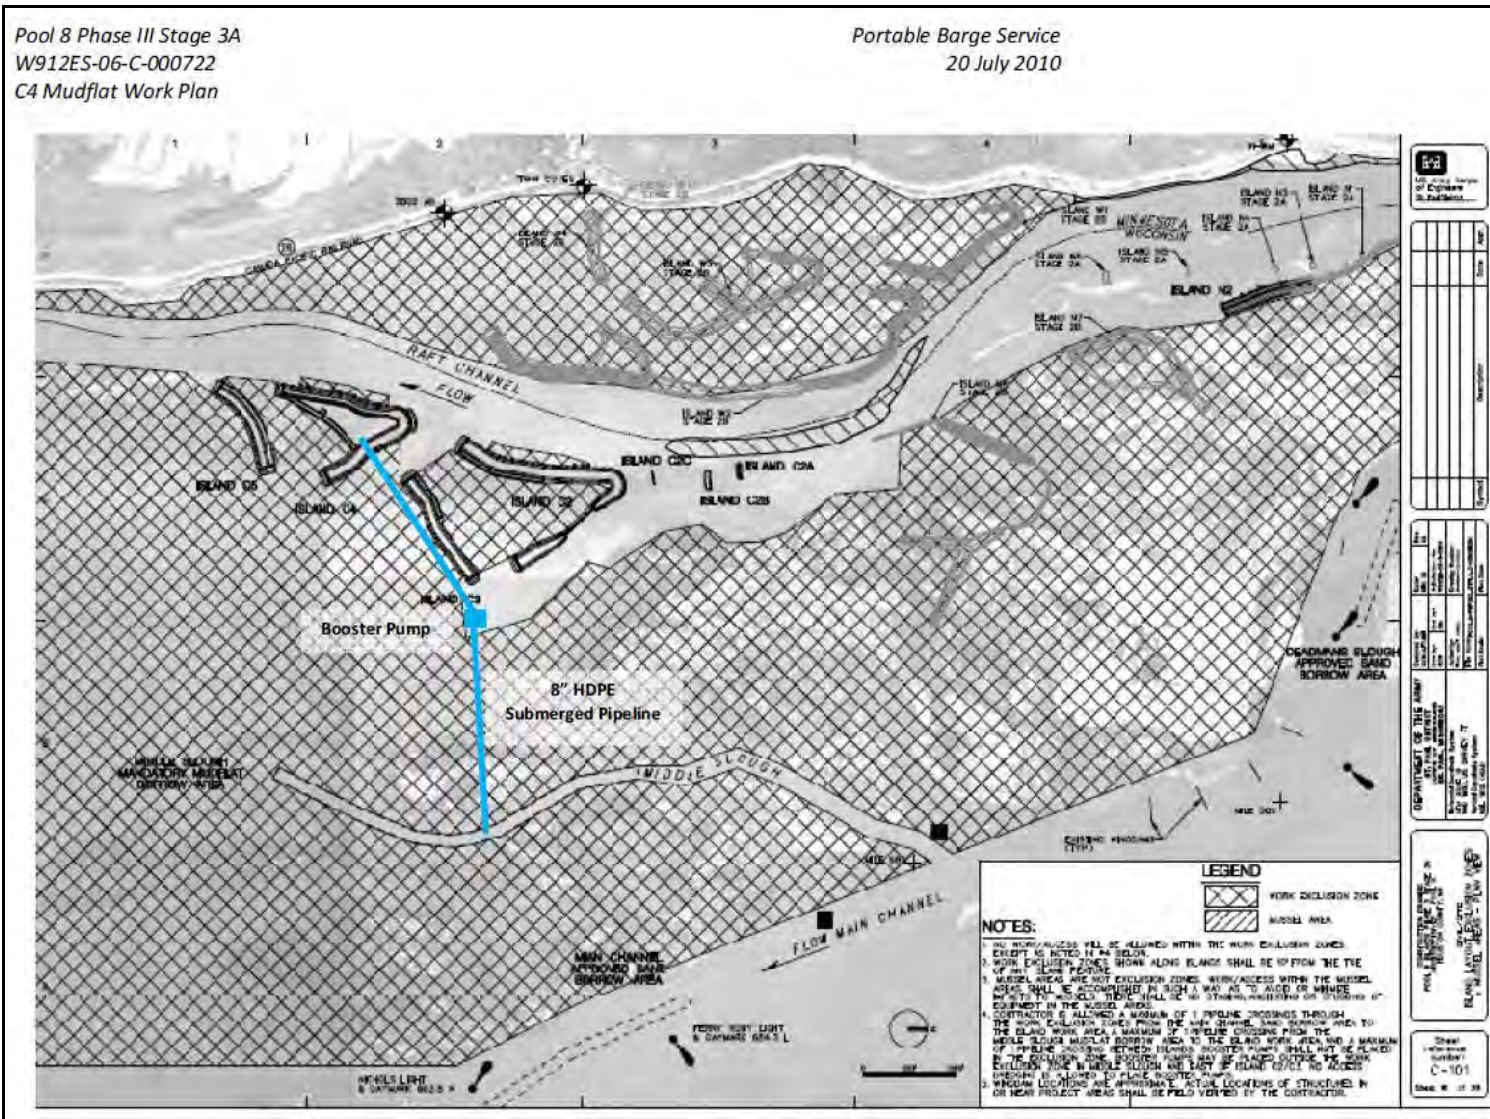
F-4 Emergent Wetland Work Plan – Stage 3A
